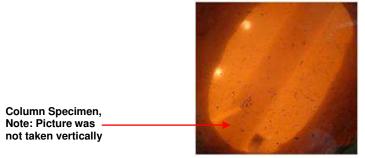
Observation of the Column Specimen During the HFT Test Through the Furnace Protected Glass.
